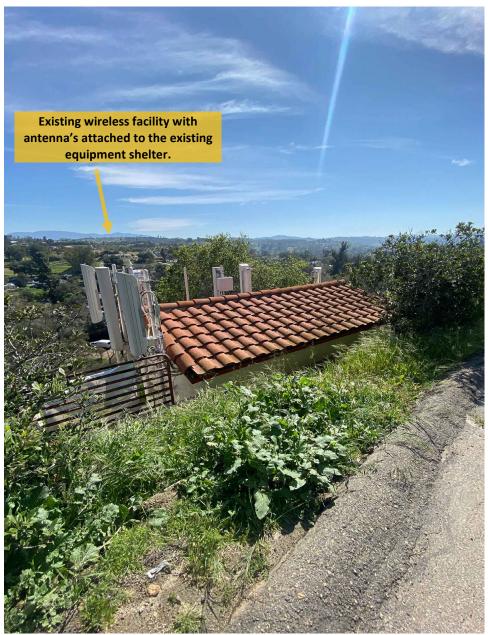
Existing Southeast view of 15.6-foot-tall wireless facility with equipment located on and within a 180 square feet equipment shelter.
